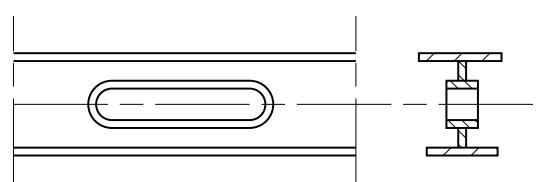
Stiffening of large openings in primary supporting members - Solution 2
